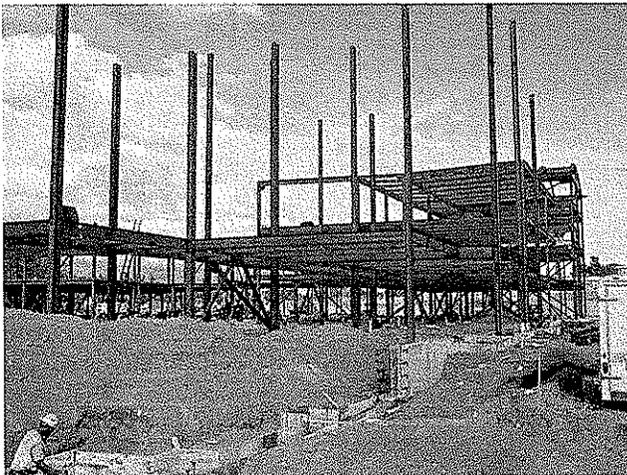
View northeast toward building segments E and F, September 16, 2010.
